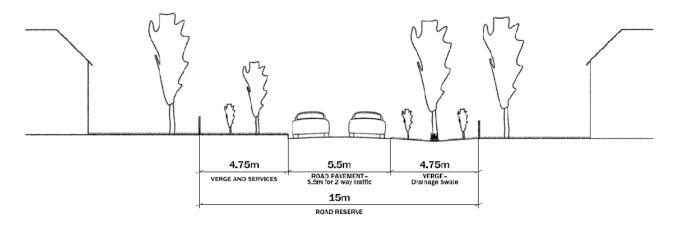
Cross section for typical internal 15m road reserve for access streets.
